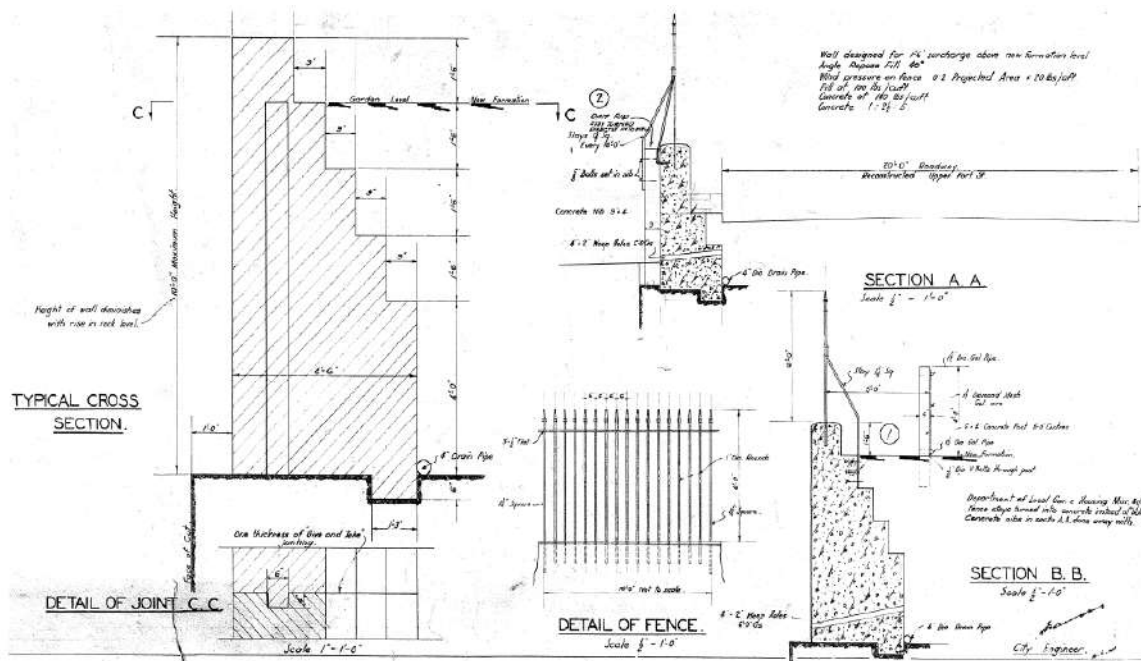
Portion of a drawing detailing the perimeter fencing around the road excavation, documented by the City of Sydney and dated 4 June 1941. (Source: City of Sydney Archives Series 466, item E3-38/28)
